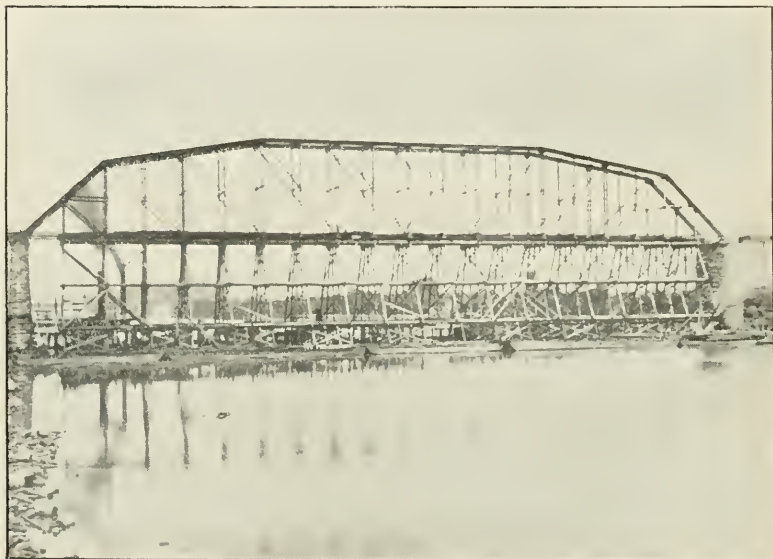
OHIO CONNECTING RAILWAY BRIDGE.
